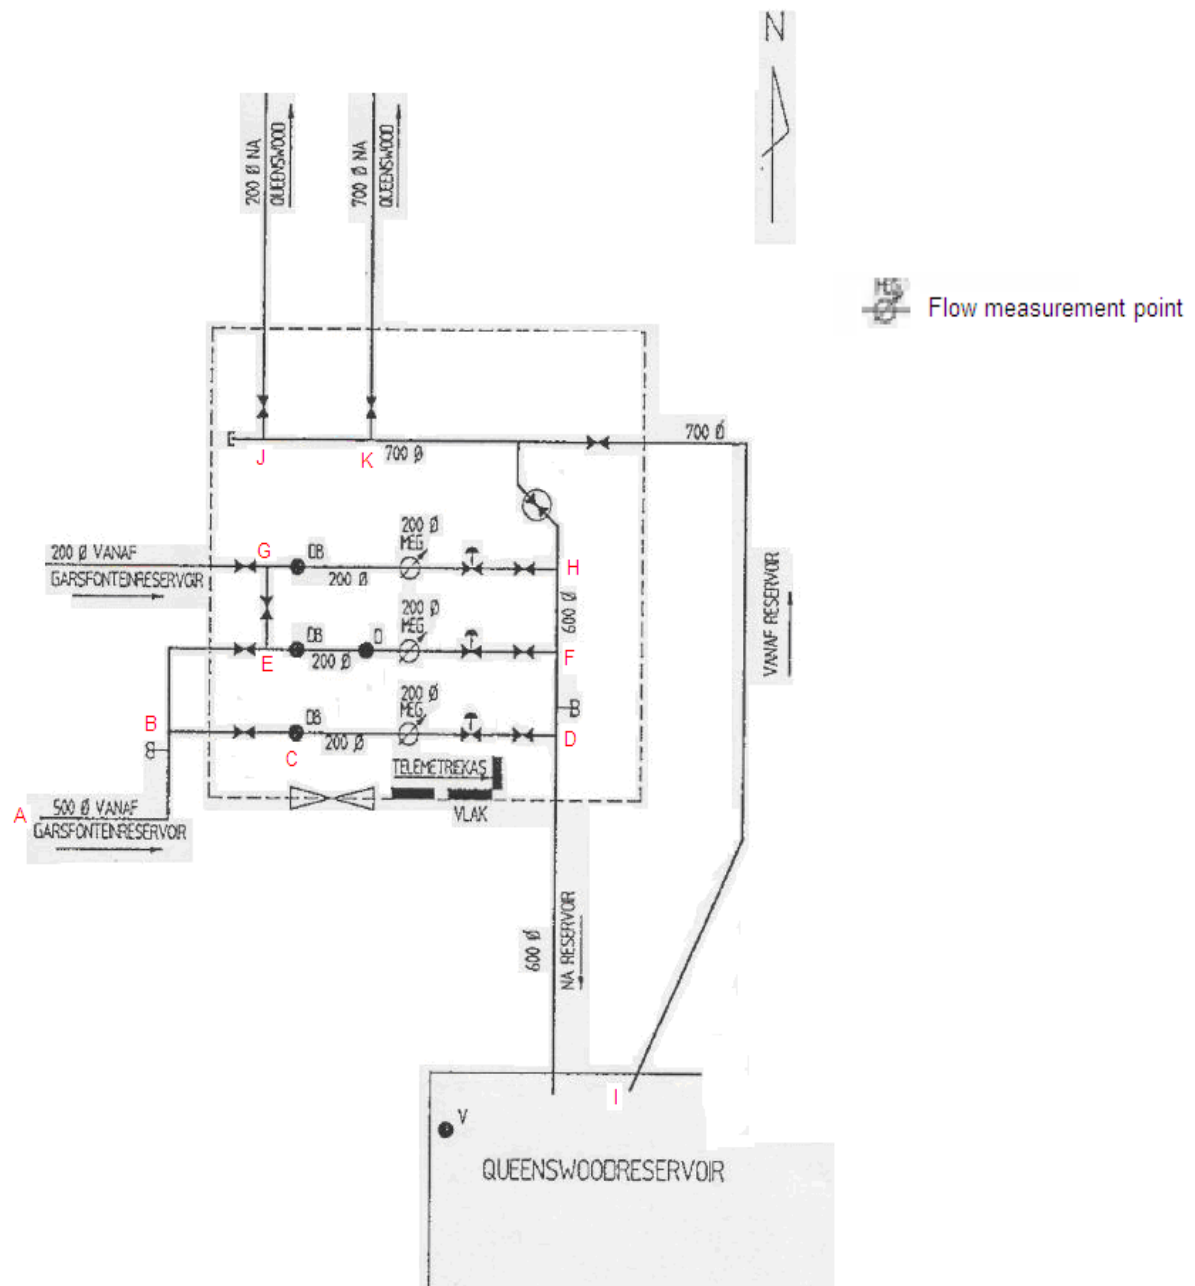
Schematic layout of pipe work in control room at Queenswood reservoir
